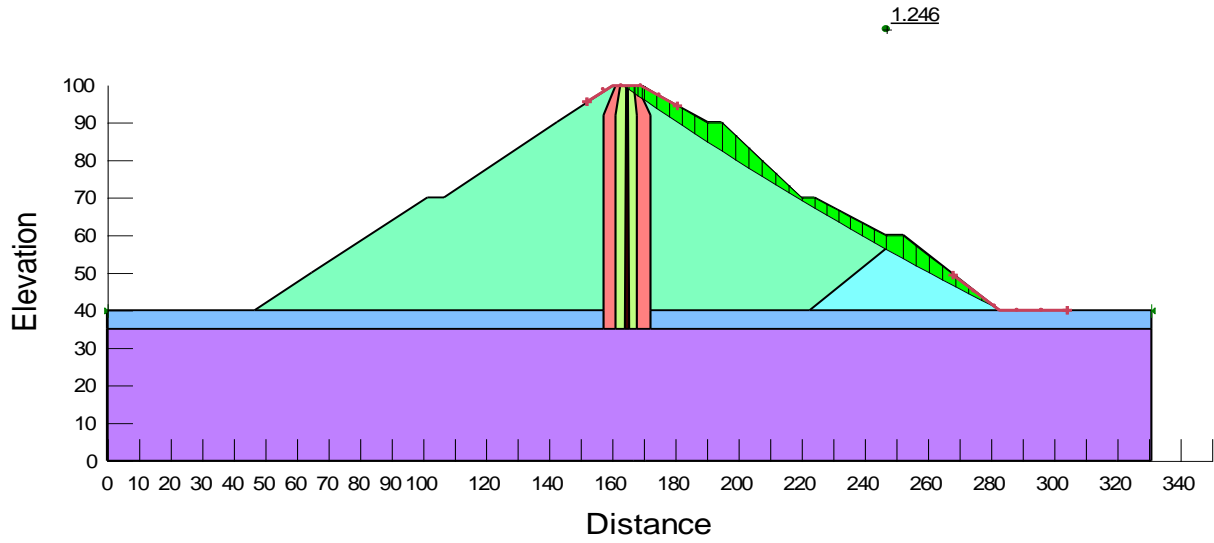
Slope Stability at end construction with earth quake AC (D/S)
